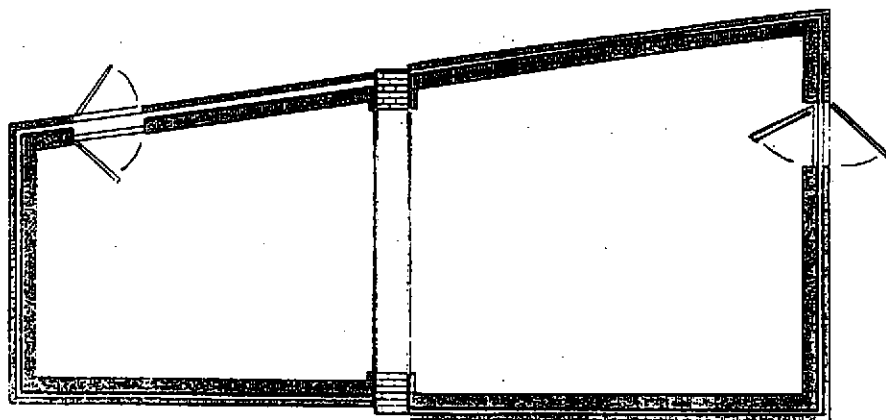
PLAN OF HORIZONTAL TRANSMISSION SUITE.
